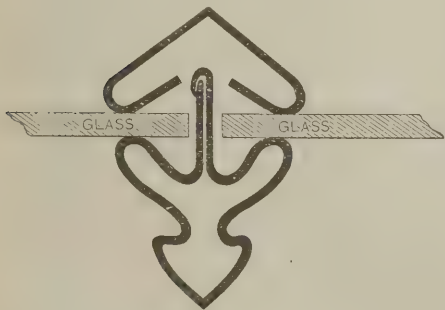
Full Size Cross Section of Sash Bar and Cap.
